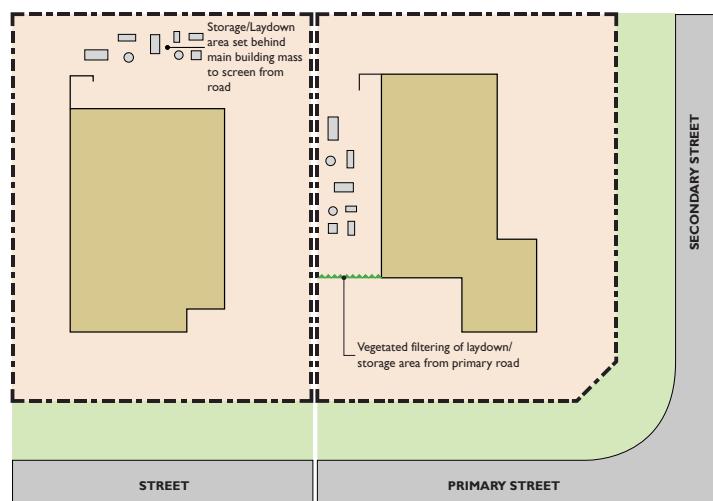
VISUAL SCREENING PLAN/FILTERING PLAN
